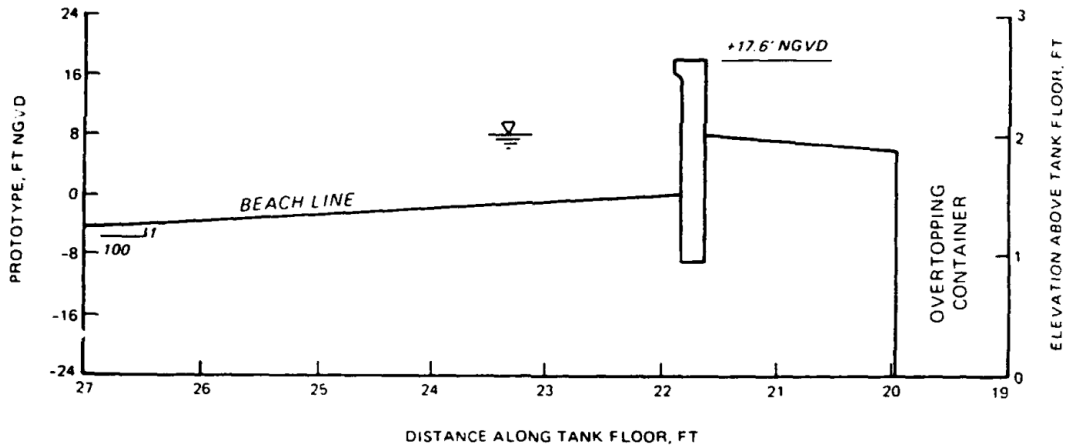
Vertical wall with recurved parapet, tested in Ward and Ahrens (1992)
